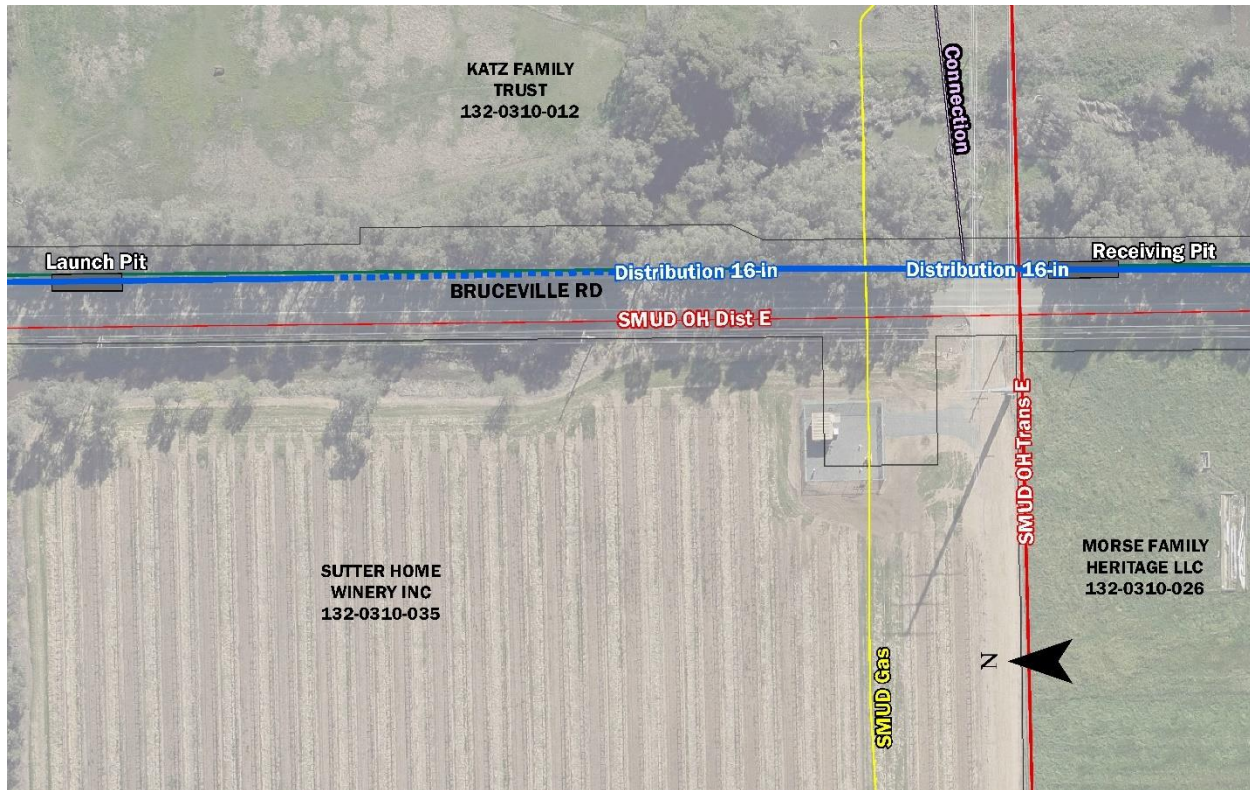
Proposed Trenchless Crossing of Drainage at Bruceville Road
